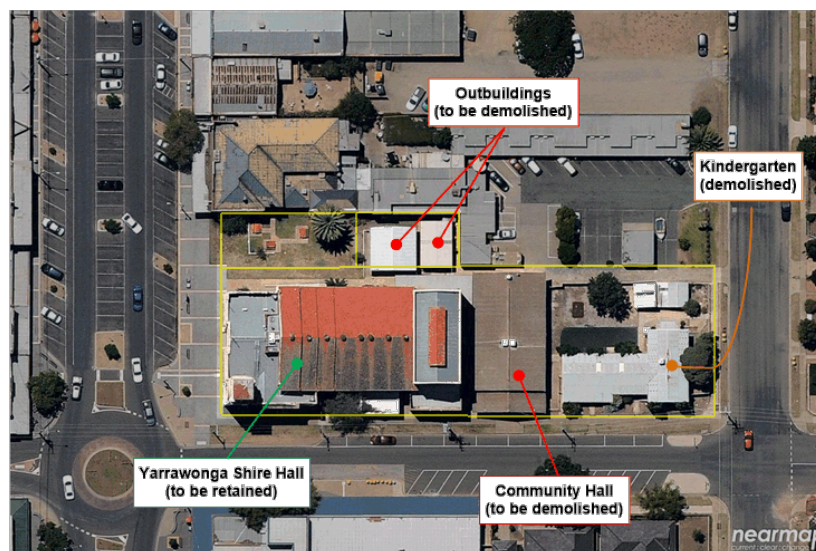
Subject Site, Including significant site buildings (source: Nearmap)
